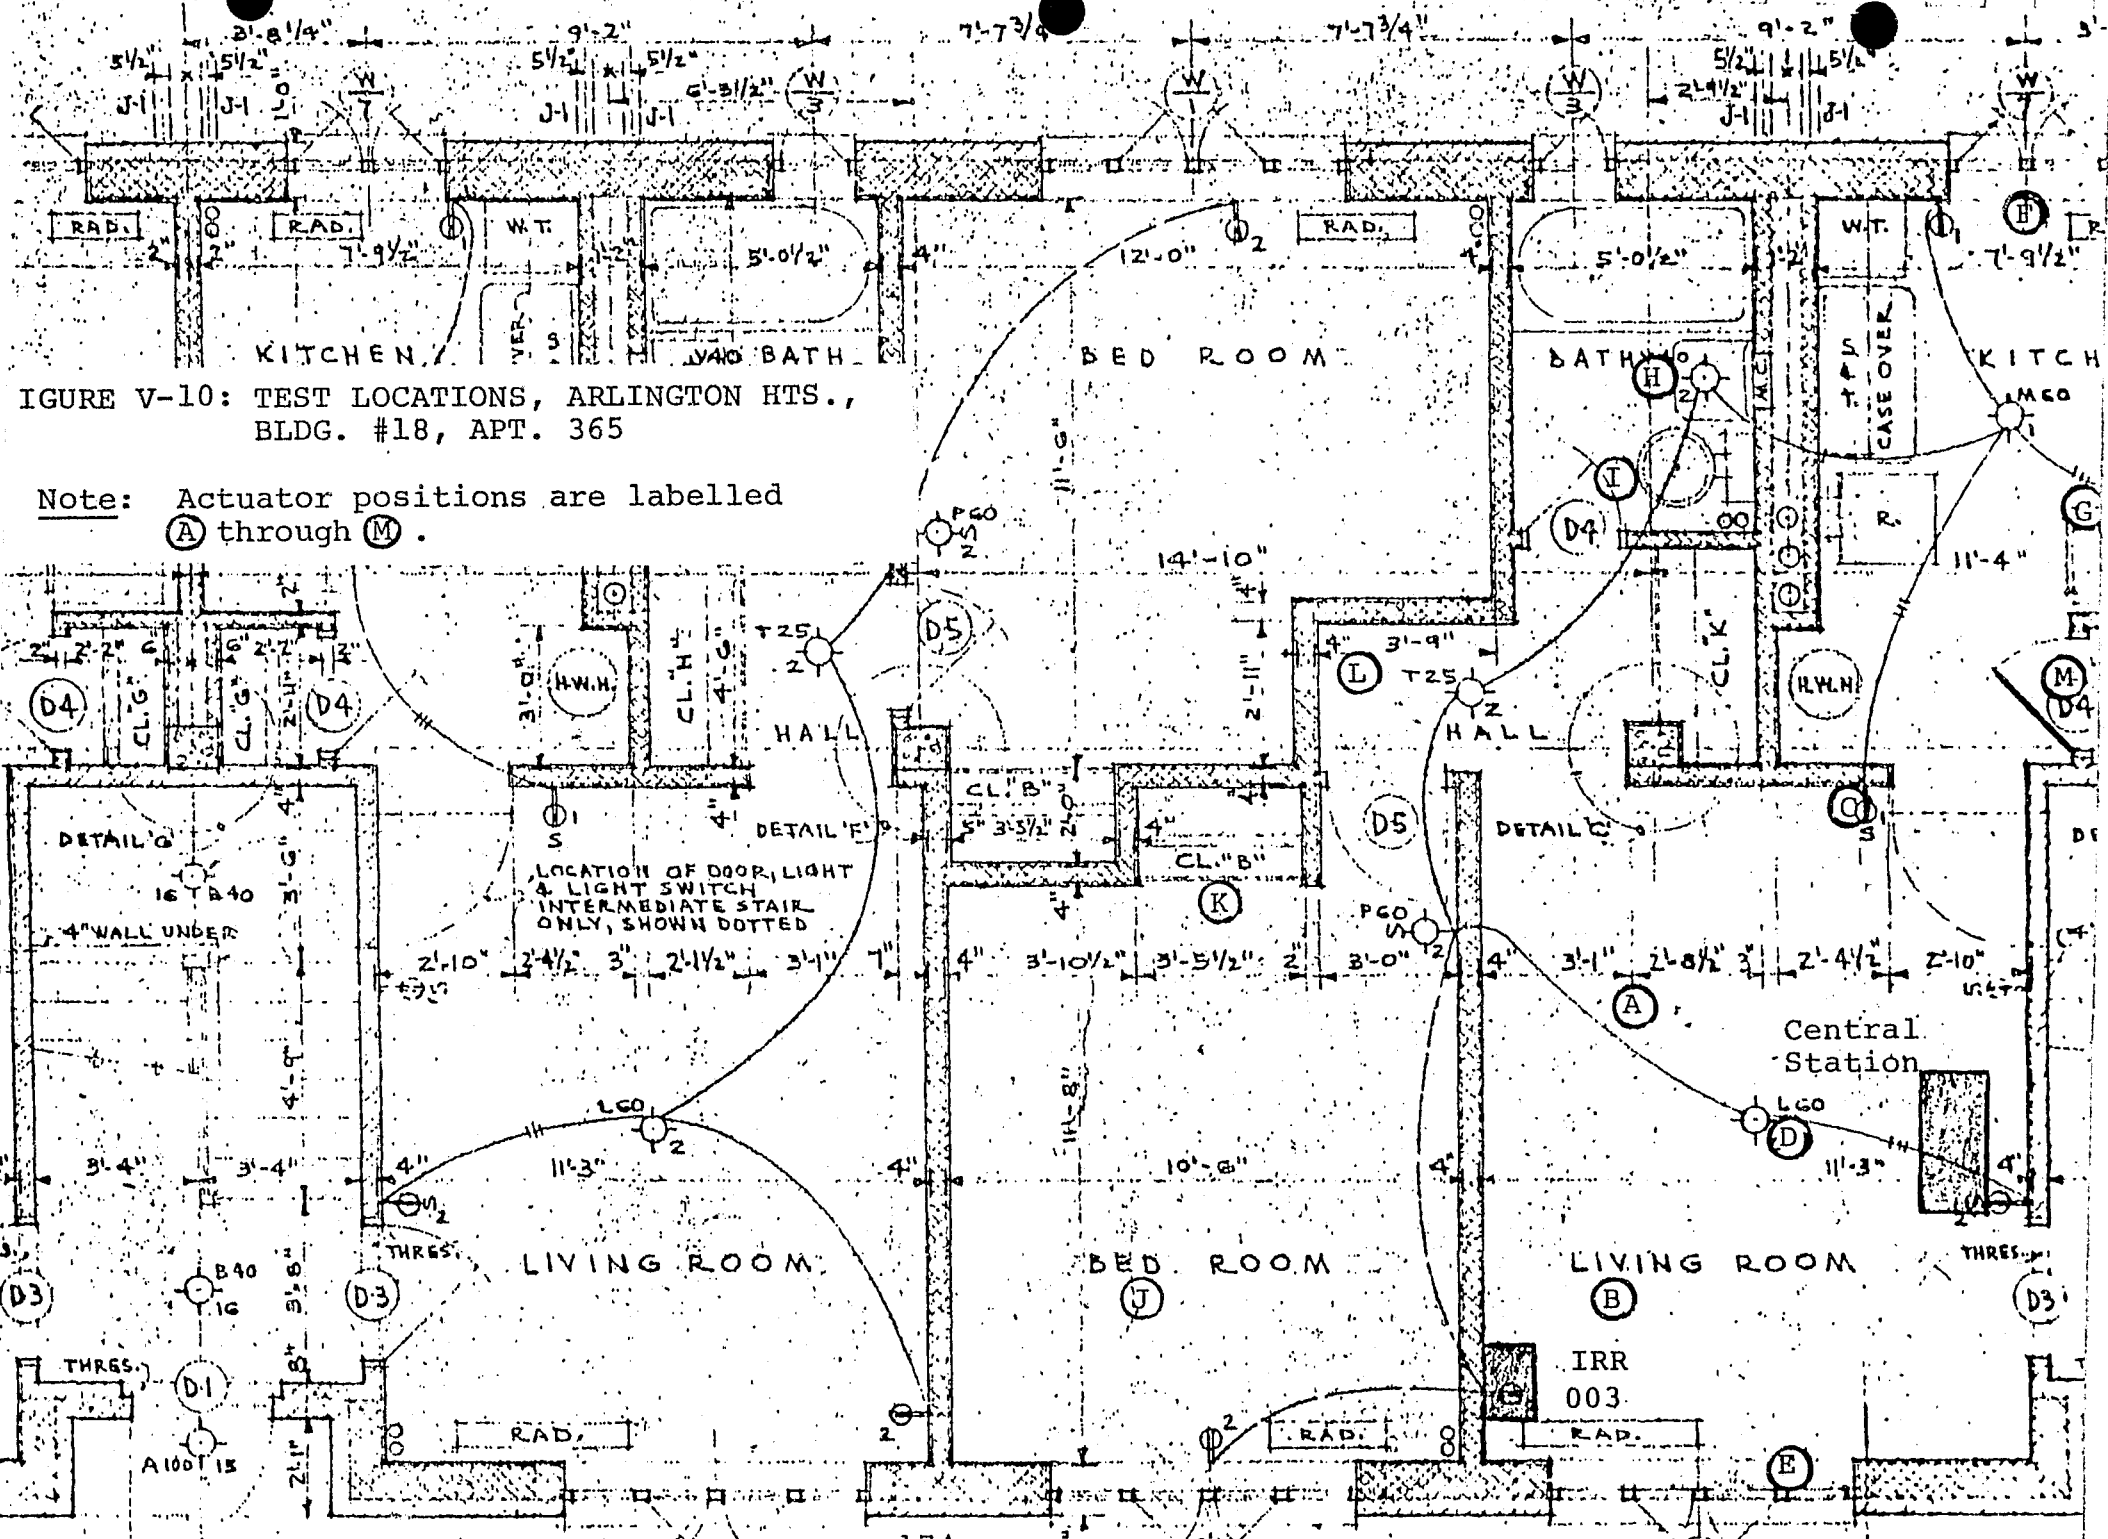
TEST LOCATIONS, ARLINGTON HTS., BLDG. #18, APT. 365
